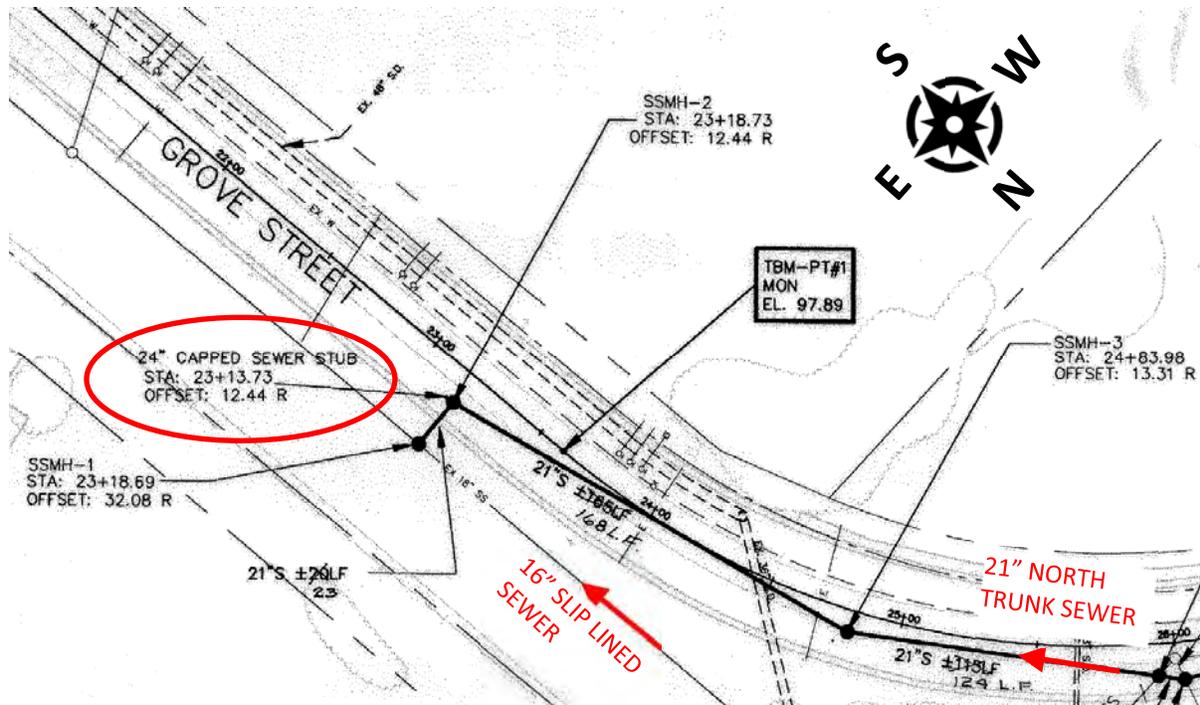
Capped Stub for Future Extension of North Trunk Sewer
